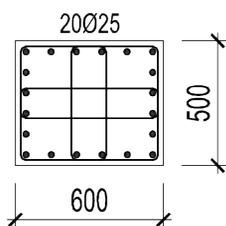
Longitudinal Reinforcement Layout – Column 2B
